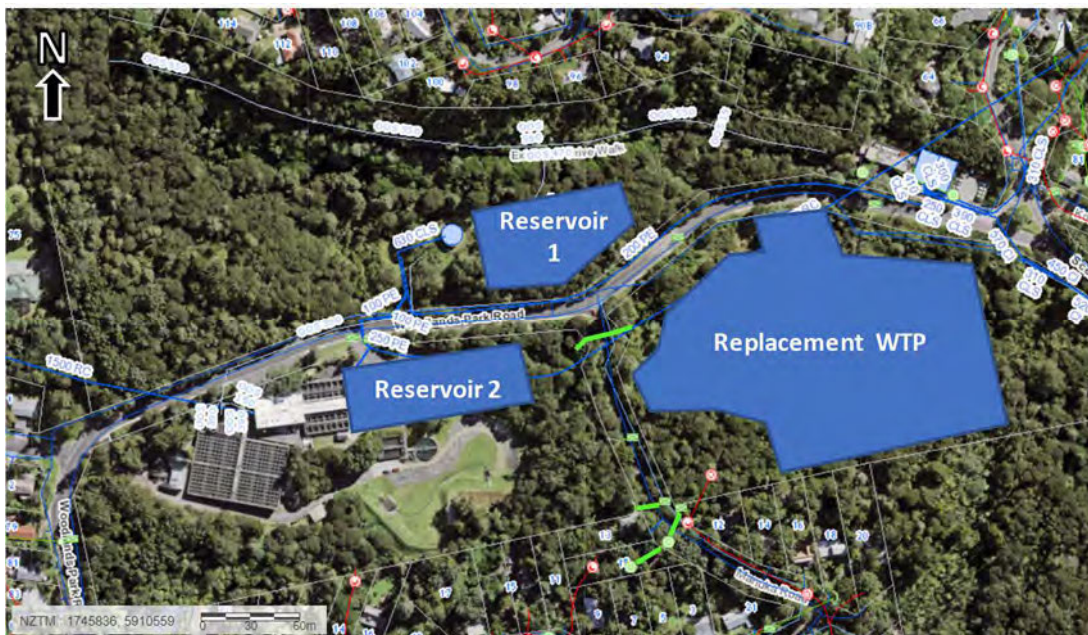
Indicative site layout overlain on Auckland Council GeoMaps showing location of existing Council owned services in adjacent roads (blue = water, red = wastewater and green = stormwater).
